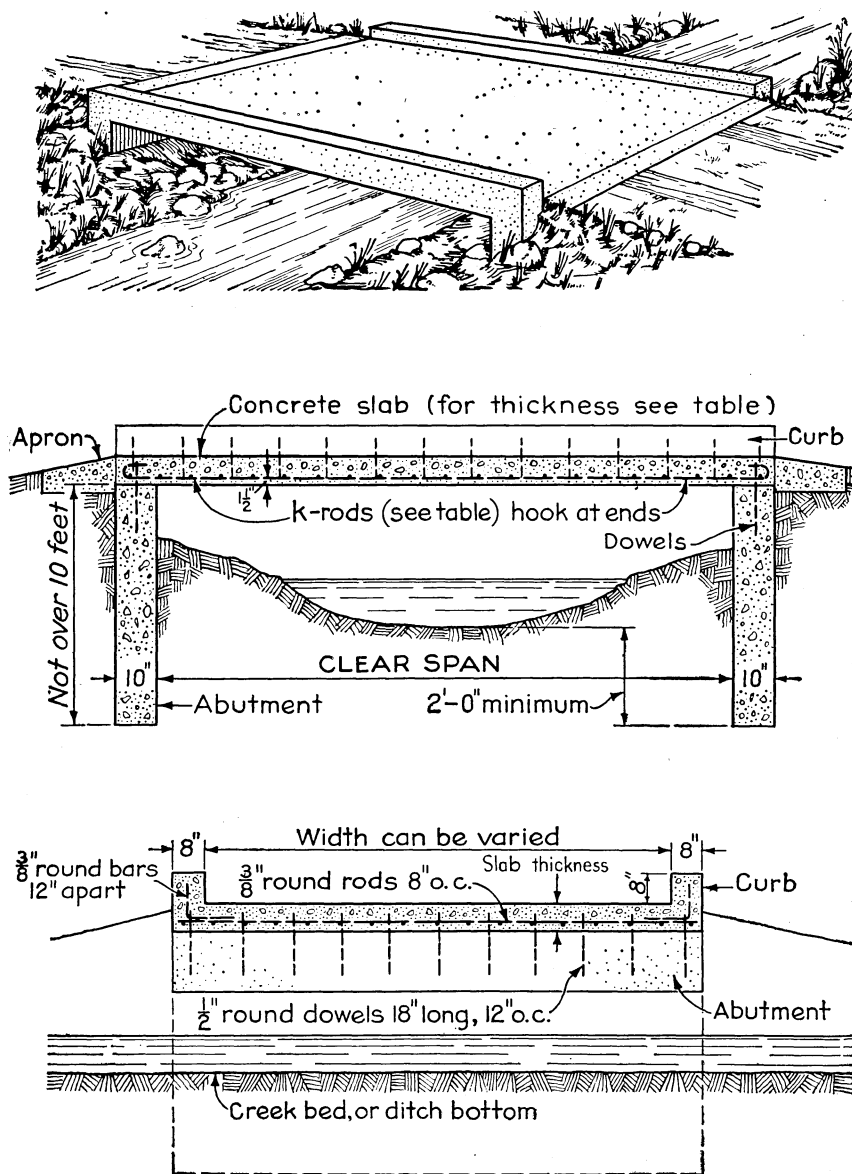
Concrete bridge for irrigation ditches and small streams.
